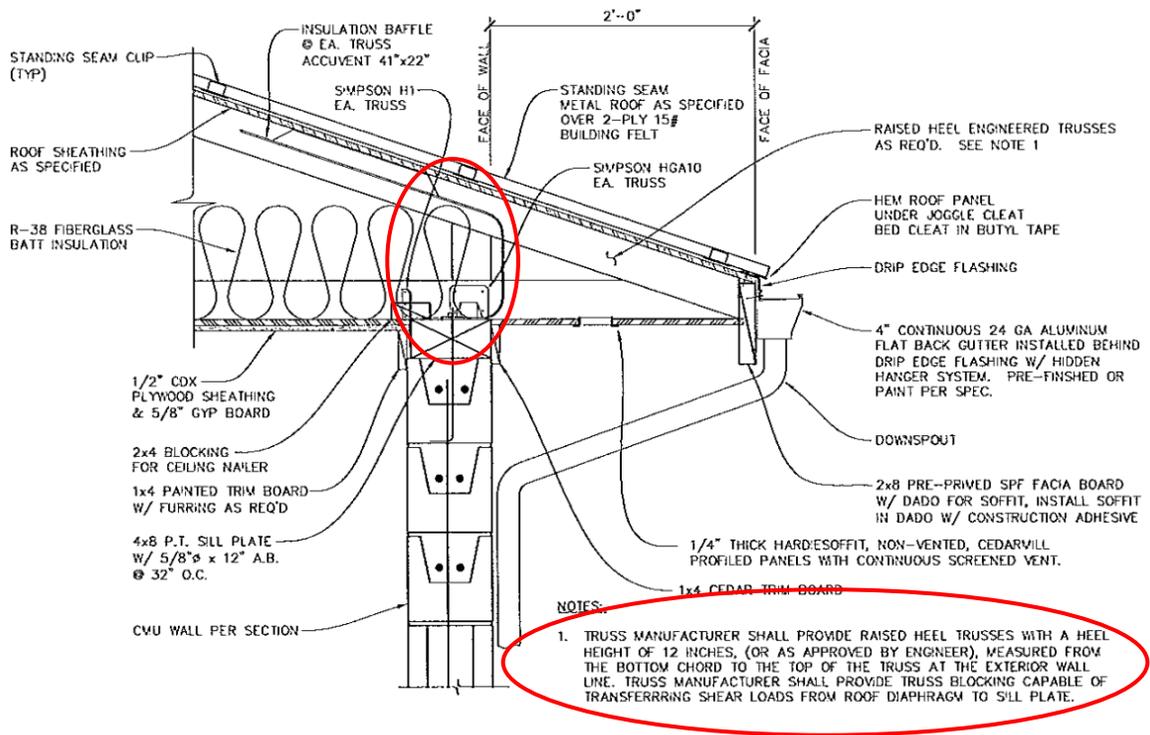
Inadequate Connection between Blocking and Masonry Wall Top Plate
